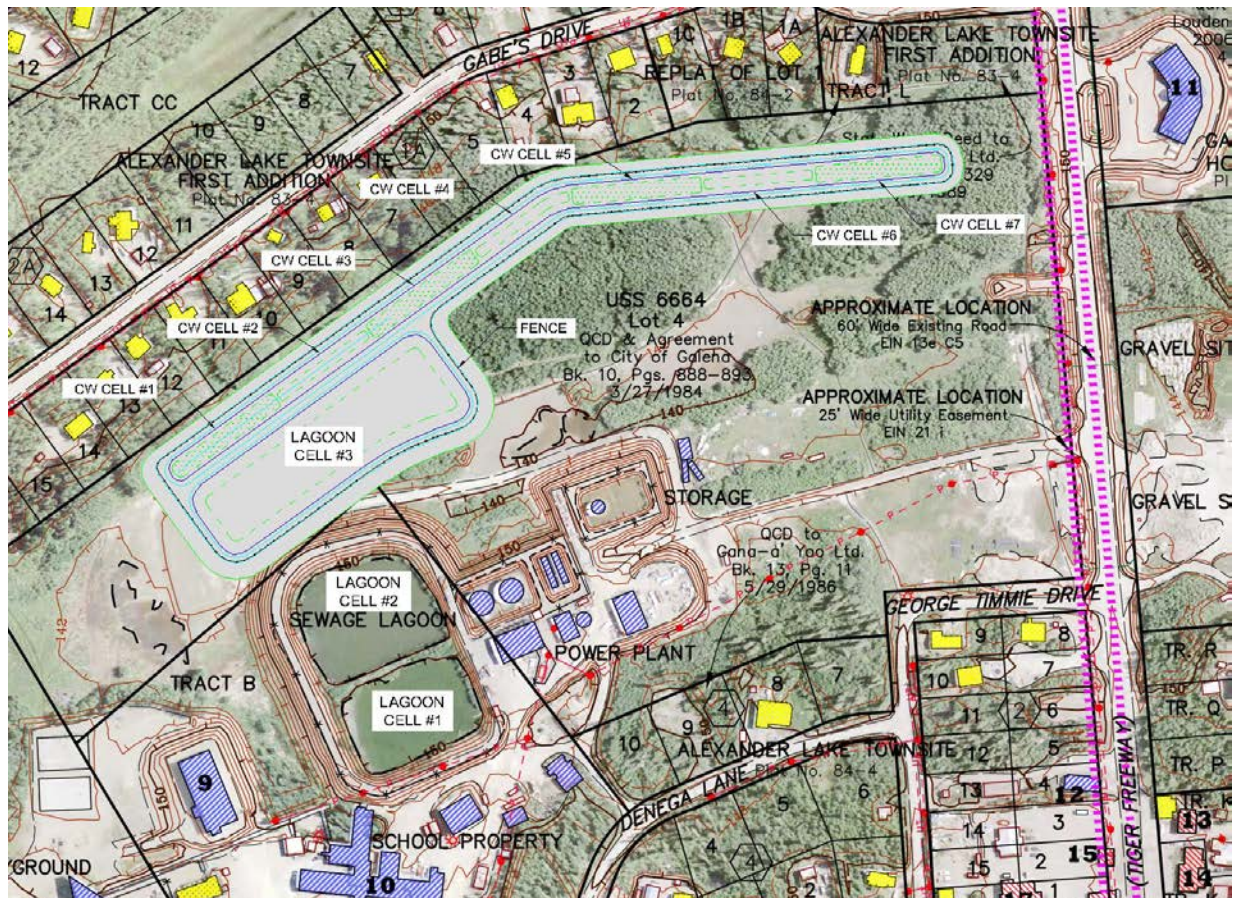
Plan view of proposed Lagoon Cell #3.
